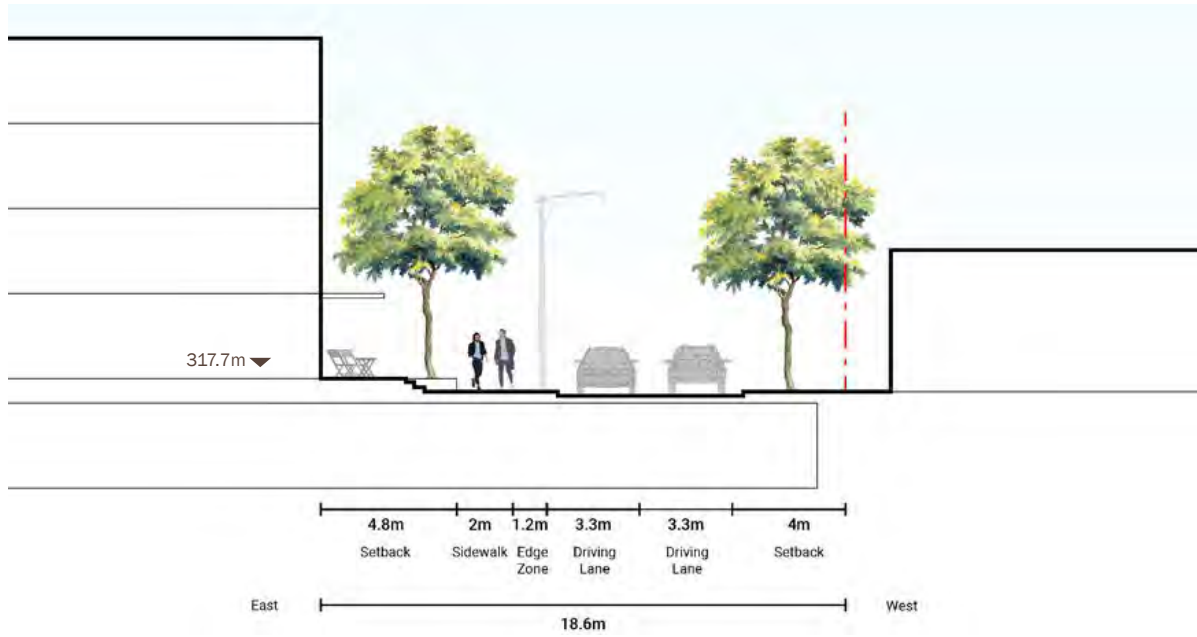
Elizabeth Lane Cross-Section 1 Looking South
